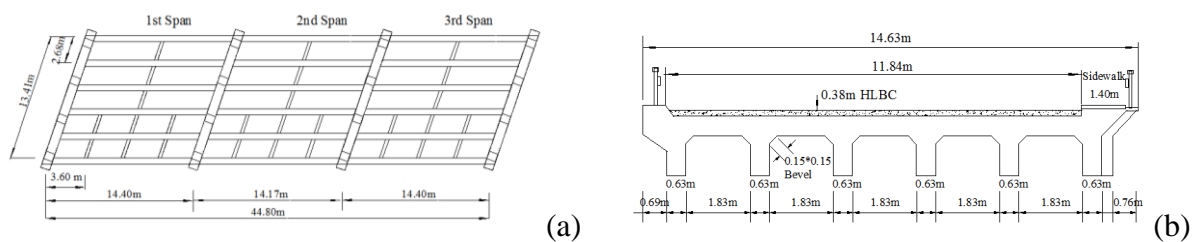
The Bridge: (a) Girder Plan; (b) Cross-section.
